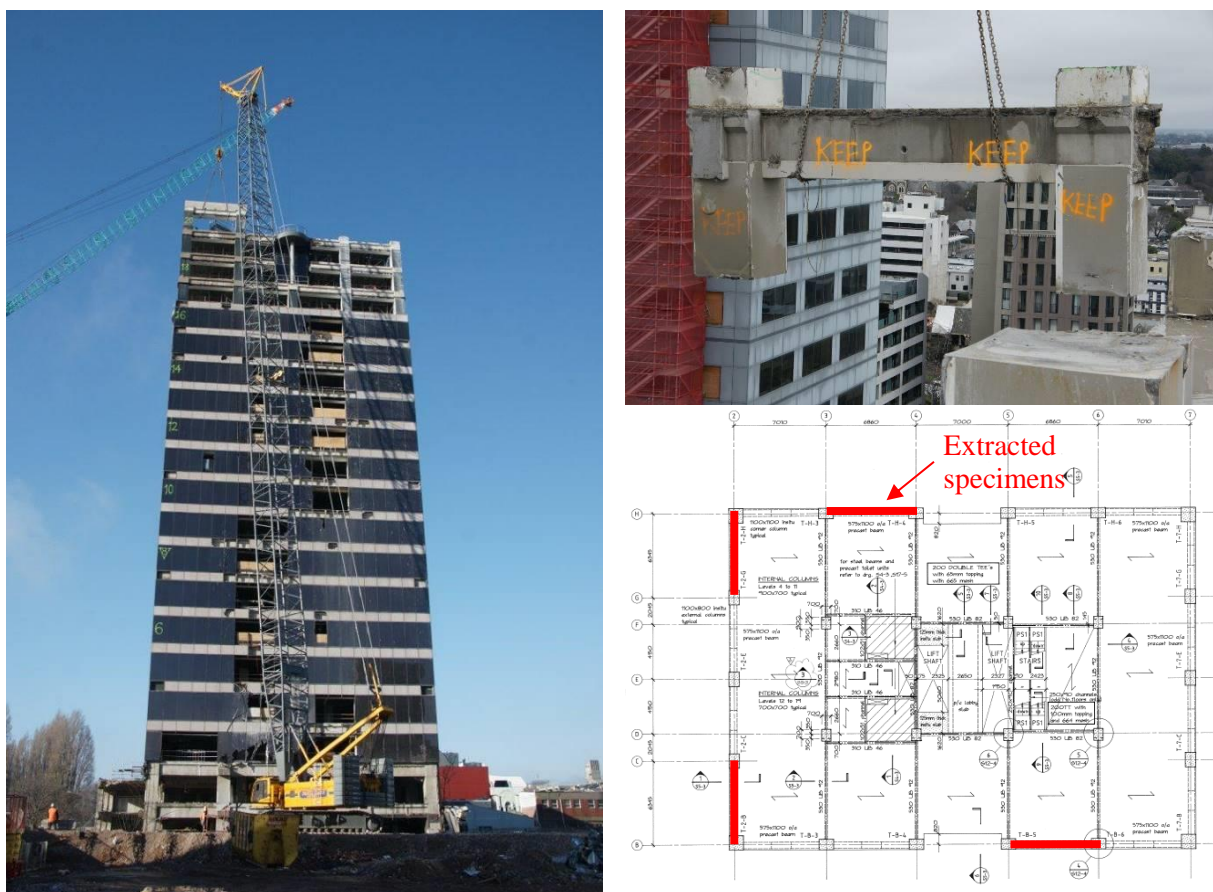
Elevation of the PWC building during the deconstruction process (left); extraction of one of the H-frame specimens (upper-right); typical floor plan view at the upper levels (lower-right), red lines indicate locations where the specimens were taken out of the 16th floor level (Photos courtesy of Stefano Pampanin).
